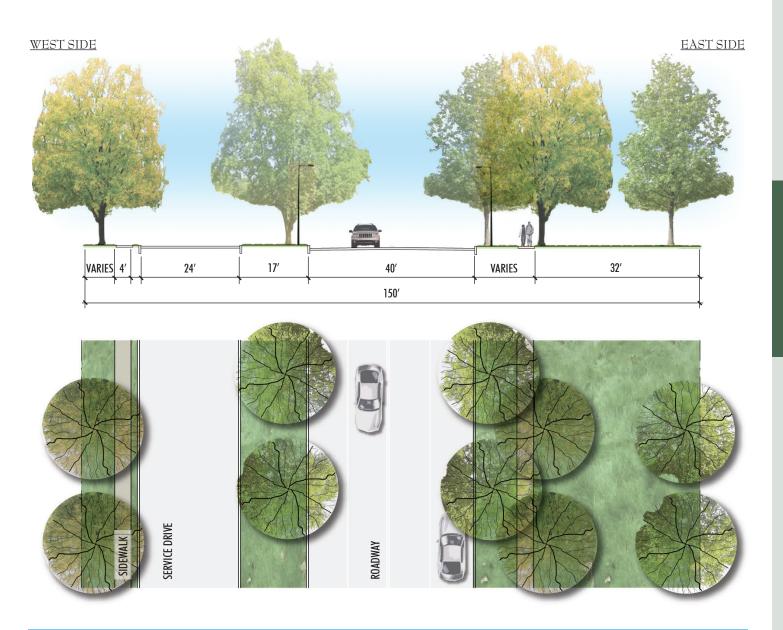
36: Southern Parkway: Zone 1, 4 & 5 Existing Conditions Section and Plan (with one service drive)
